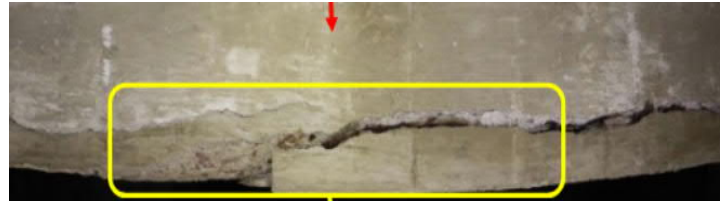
Unit 4 South Sump Crack in West Beam
